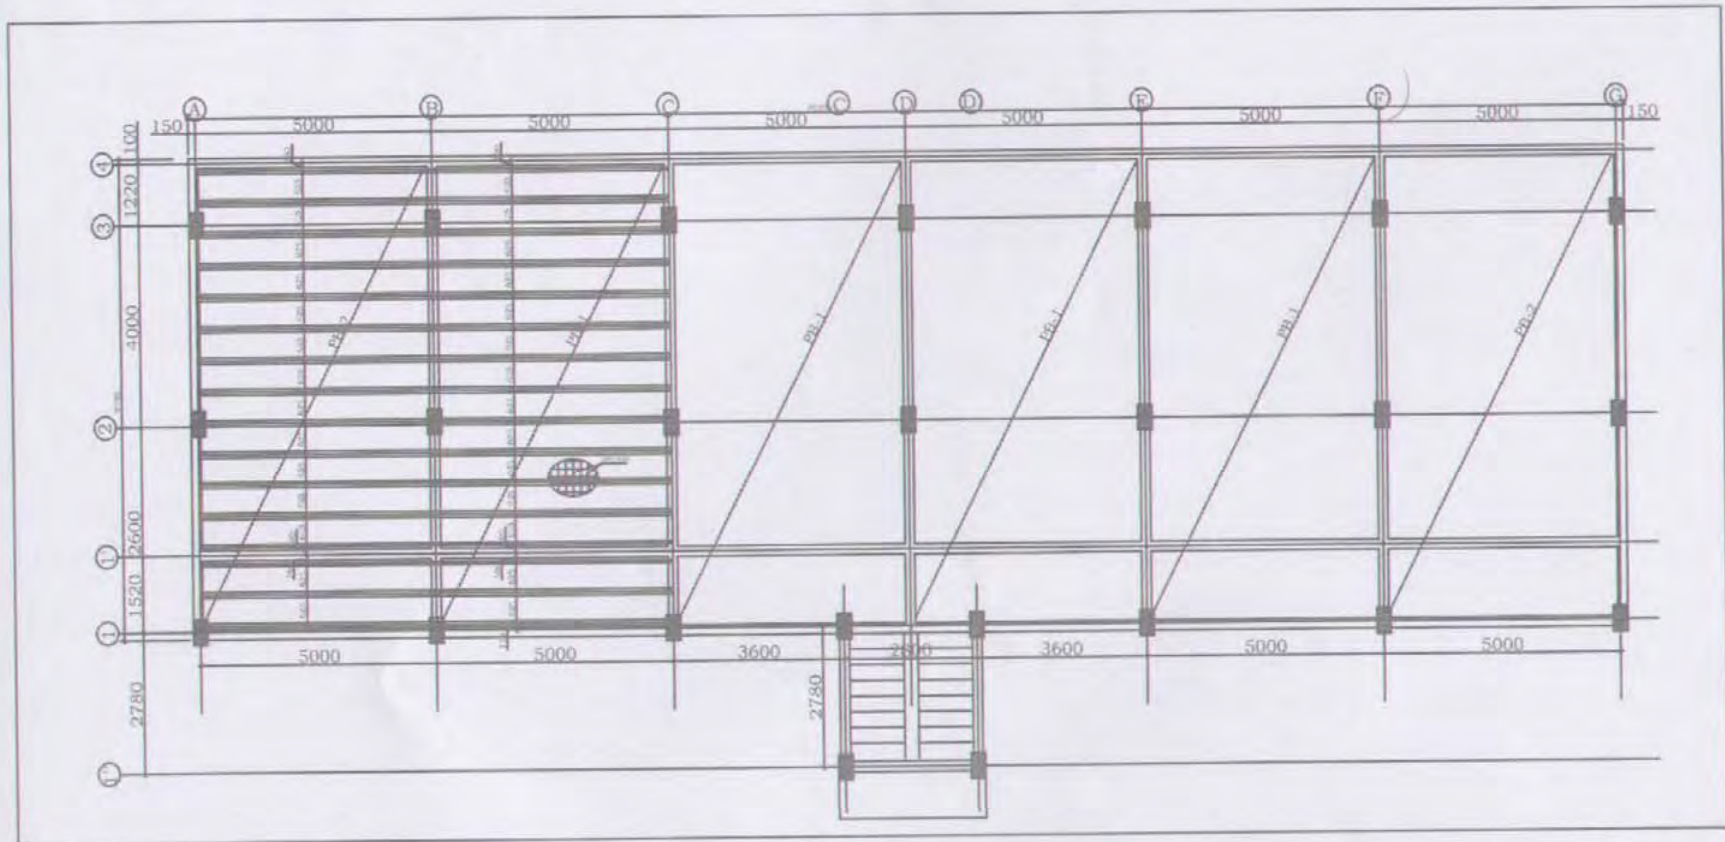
Concrete Typical (1 - 4 Floor) Slab Reinforcement Sc1:50
